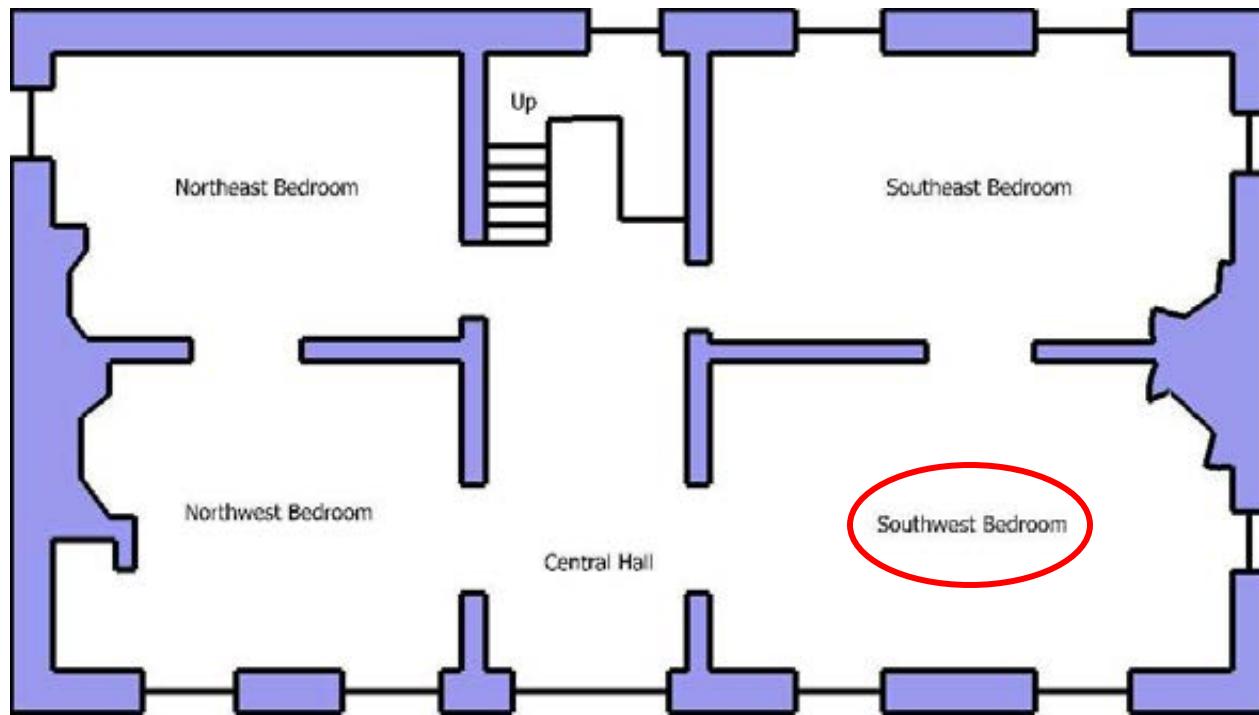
Plan of the southwest bedroom on the second floor of Bostwick's main block. Drawing by Kathleen Manicke.
